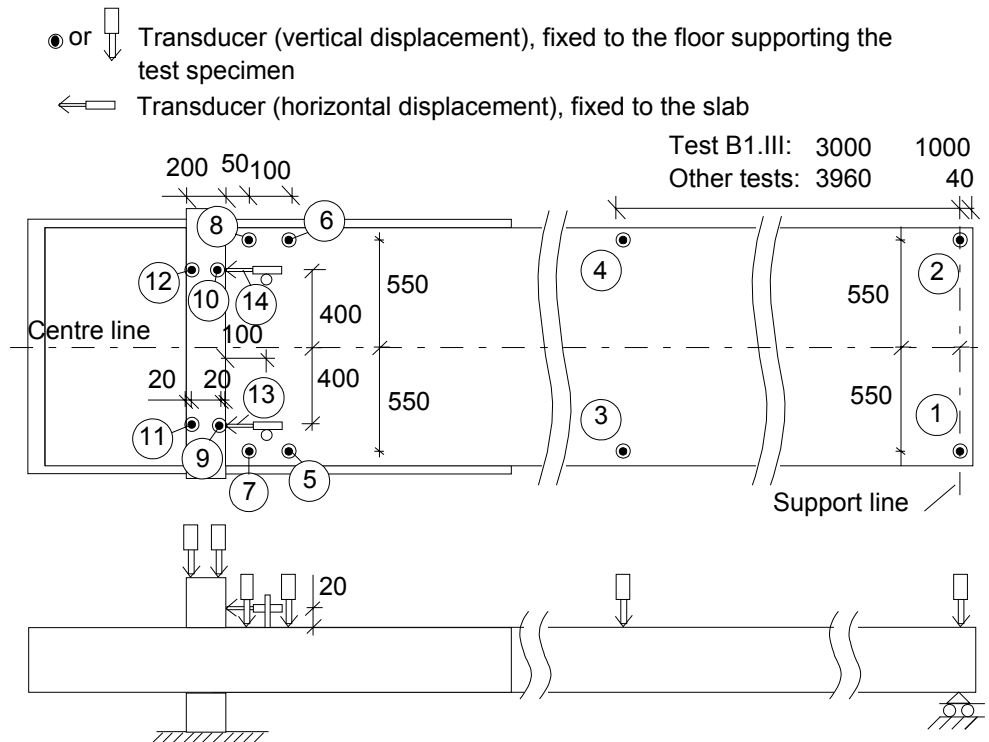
Location of transducers 1 – 14 (not in scale) for measuring displacements. Plan and elevation.
